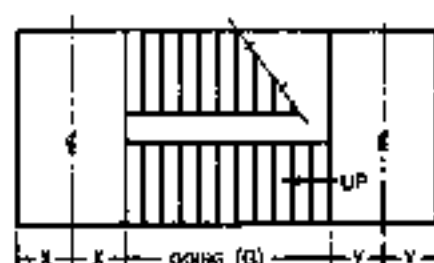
EFFECTIVE SPAN FOR STAIRS SUPPORTED AT EACH END BY LANDINGS SPANNING PARALLEL WITH THE RISERS
